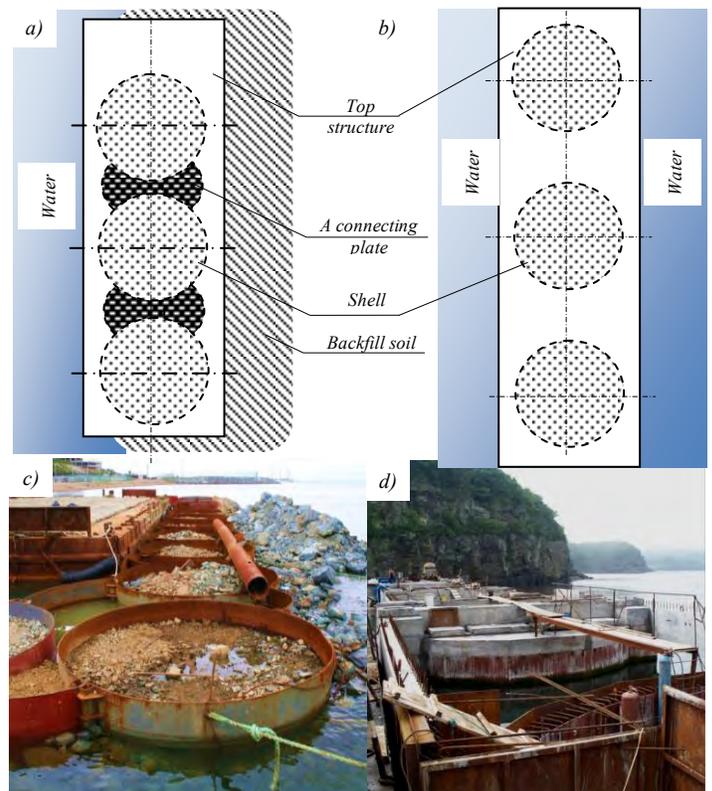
Examples of large-diameter shell structures: a) a layout of a harbor wall (plan top view); b) a layout of a pier (plan top view); c) construction of a berth in the Fedorov Bay (Vladivostok, Russia) from steel shells with the infill; d) installation of the reinforced-concrete top
